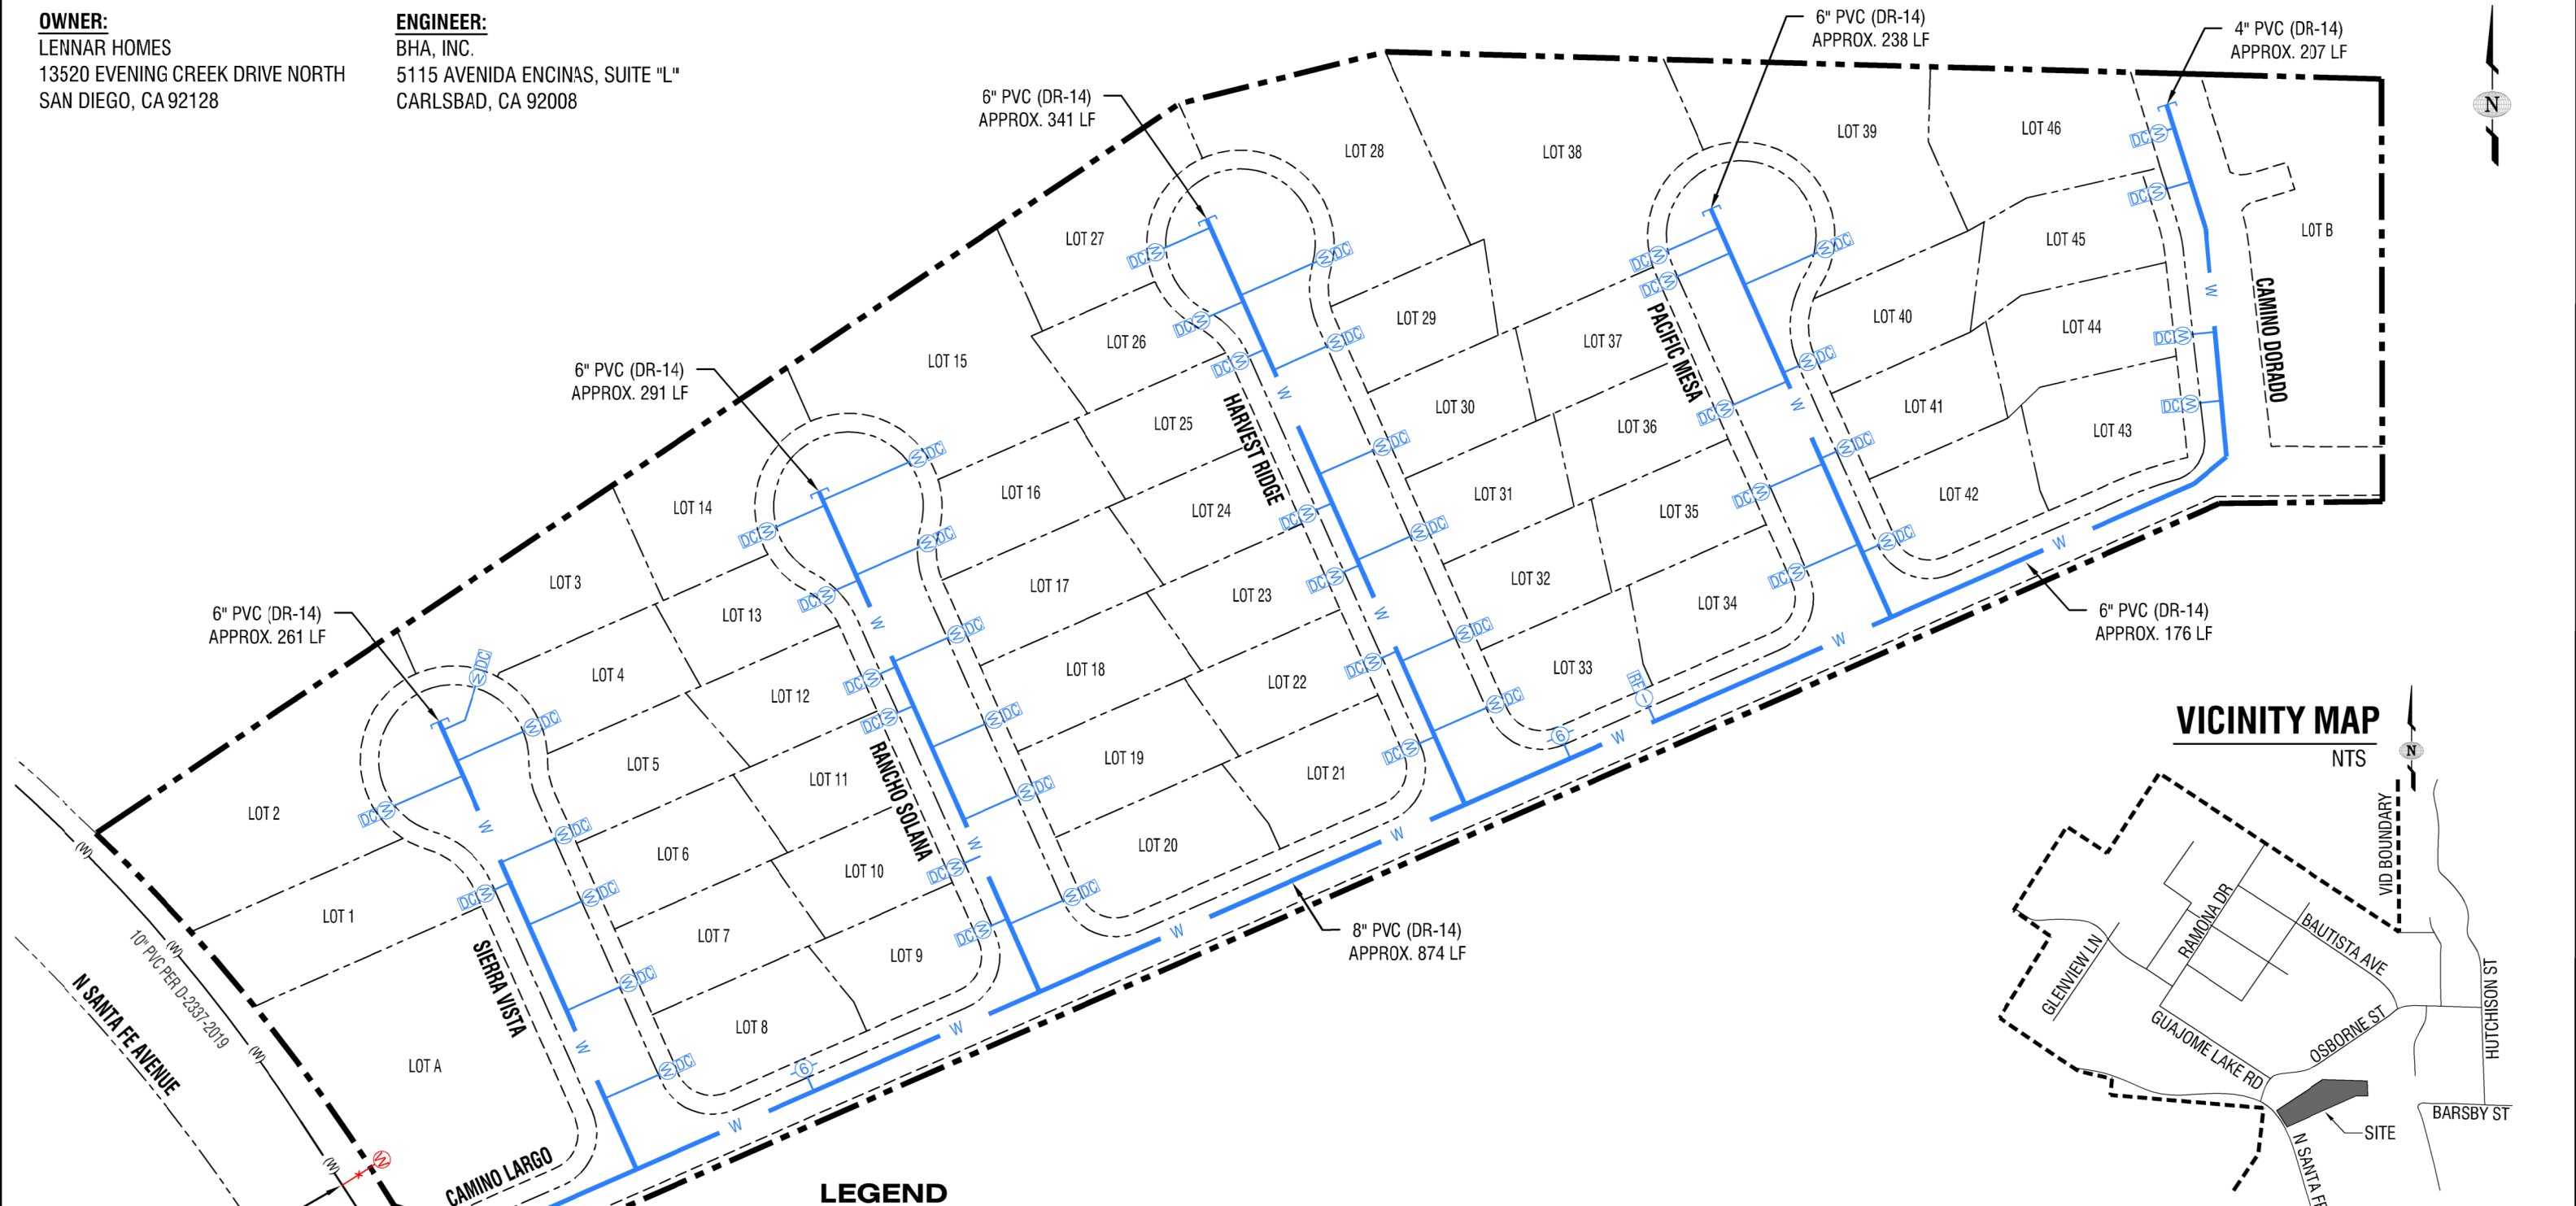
DETAILED REPORT: Under District inspection, the owner's contractor will install approximately 874 feet of 8-inch waterline, 1,307 feet of 6-inch waterline, 207 feet of 4-inch waterline, one 2-inch irrigation service and 1.5-inch meter, 46 1-inch domestic services and ¾-inch meters, two fire hydrant assemblies and make connections as approved on the plans. The new water facilities will be located within a new Specific Easement (T56) along Camino Largo, Sierra Vista, Rancho Solana, Harvest Ridge, Pacific Mesa, and Camino Dorado. The owner will also submit applications and pay the necessary fees to the District for water meters. Approval of this waterline project will allow the owner to proceed with the development of their project.
